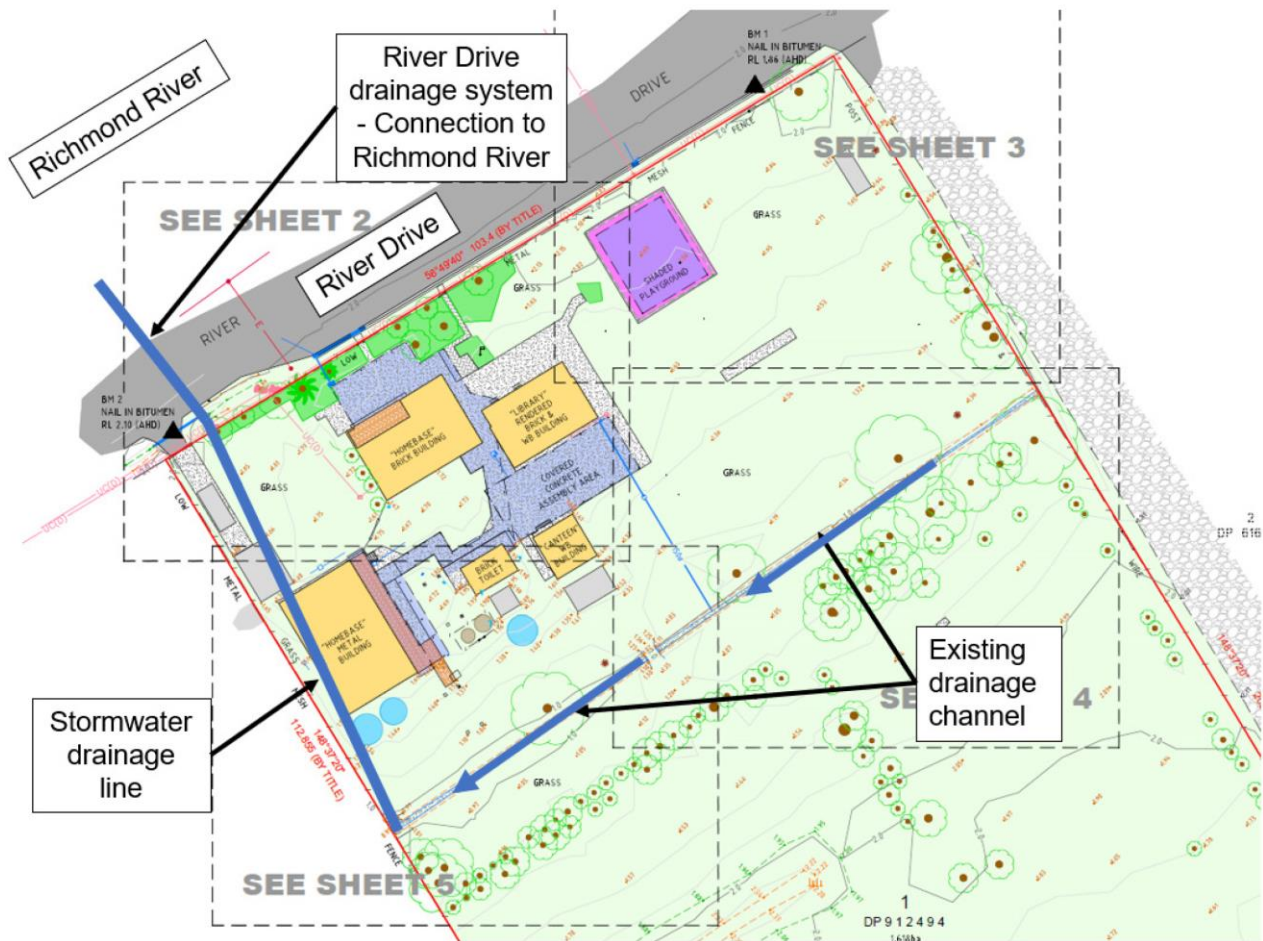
Existing stormwater drainage system (Source: Henry & Hymas Consulting Engineers)
